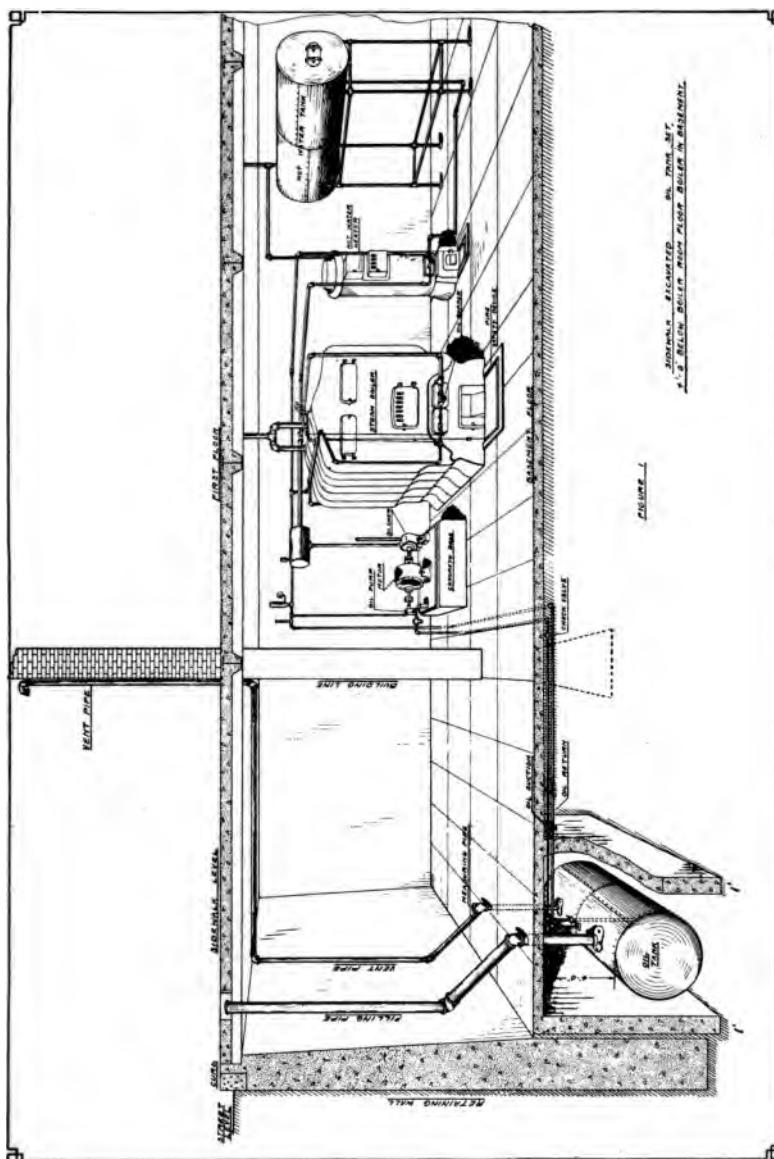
Showing Approved Method of Oil Installation in Apartment Houses, Hotels, etc.
